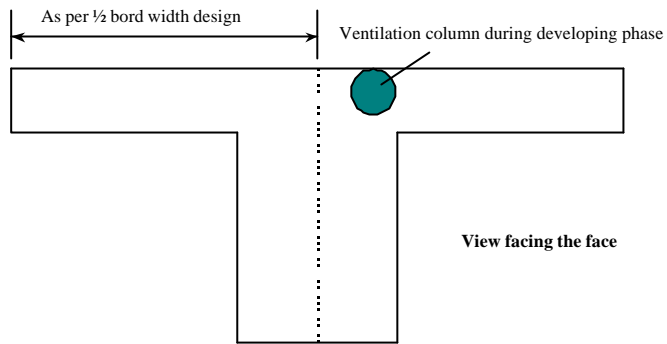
Section of basic T-raise development (view facing the face).
